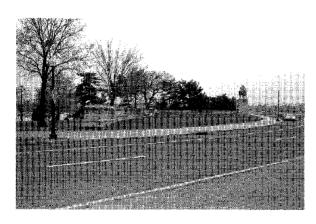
South plaza wing wall with new concrete path in same alignment as original bridle path, December 5, 1996. LINC 13-1.
